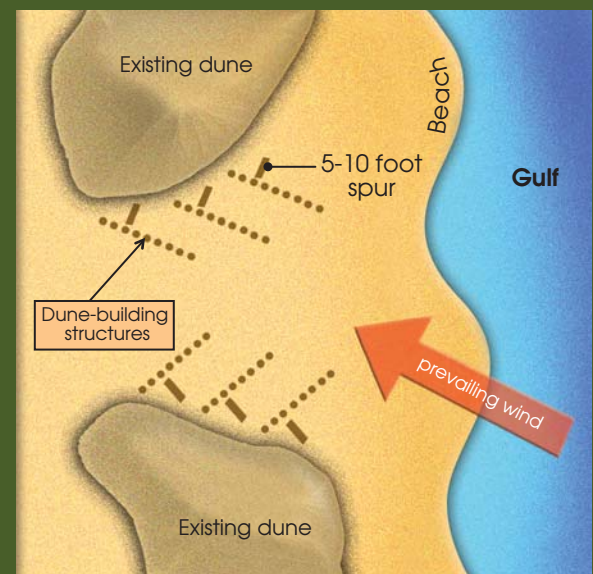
Placement of dune-building structures in washovers or washouts that do not extend across the barrier island.
